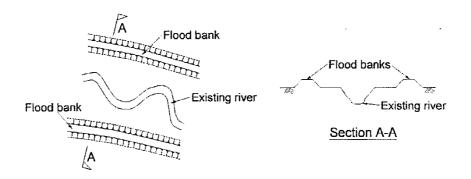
TYPICAL ARRANGEMENT FOR DISTANT FLOOD BANKS
